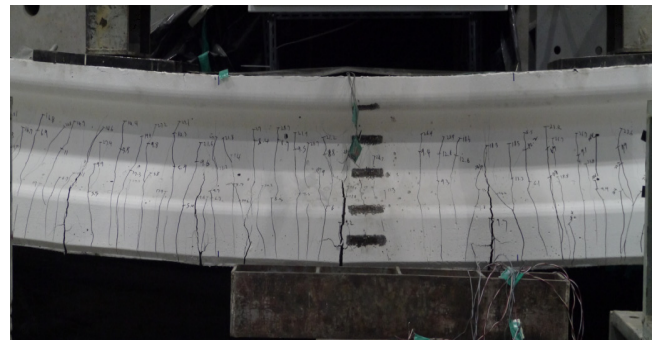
Typical Crack Patterns of F0.7S2 Beam
